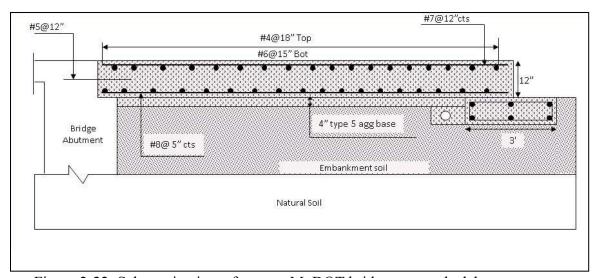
Schematic view of current MoDOT bridge approach slab arrangement
